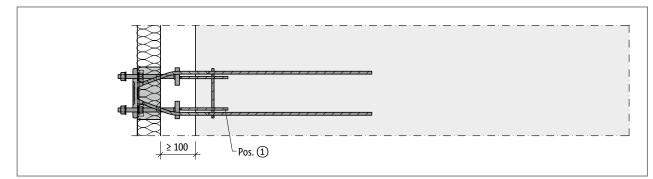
Schöck Isokorb® T type SQ: On-site reinforcement for semi-precast construction: Plan view
